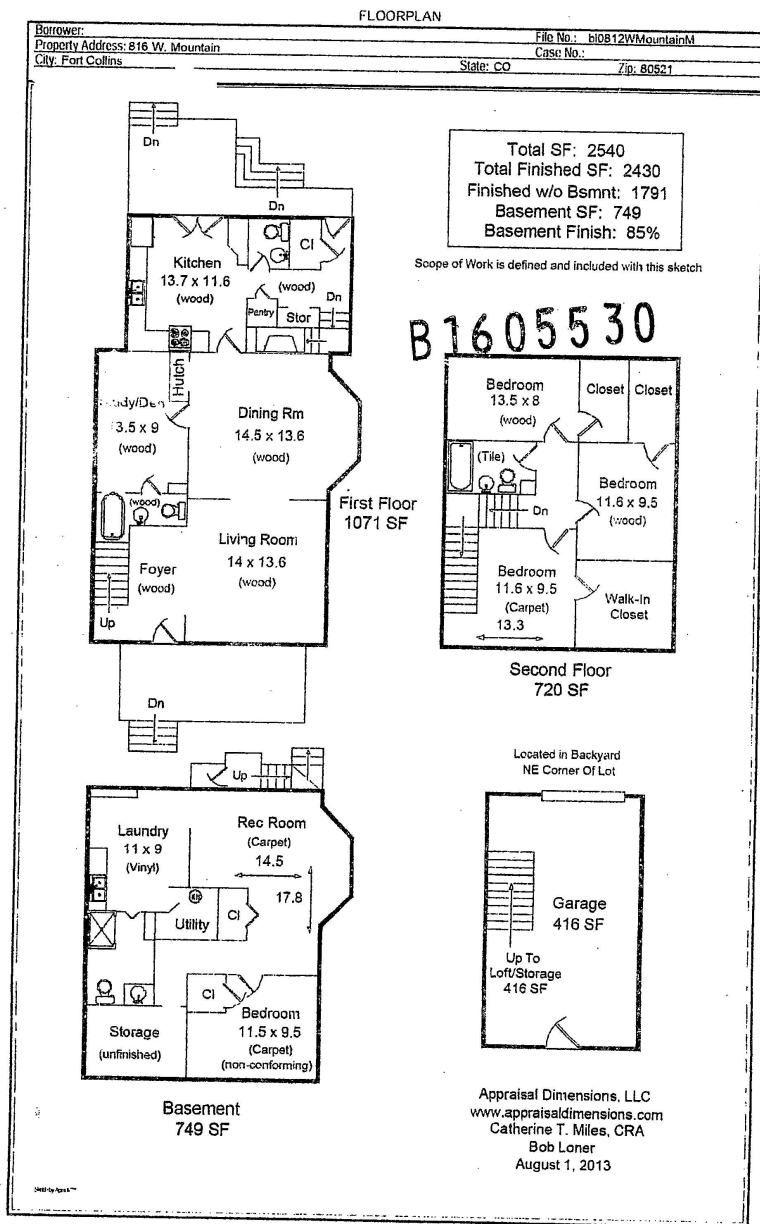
2013 floorplan. Appraisal Dimensions, LLC, August 1, 2013.
